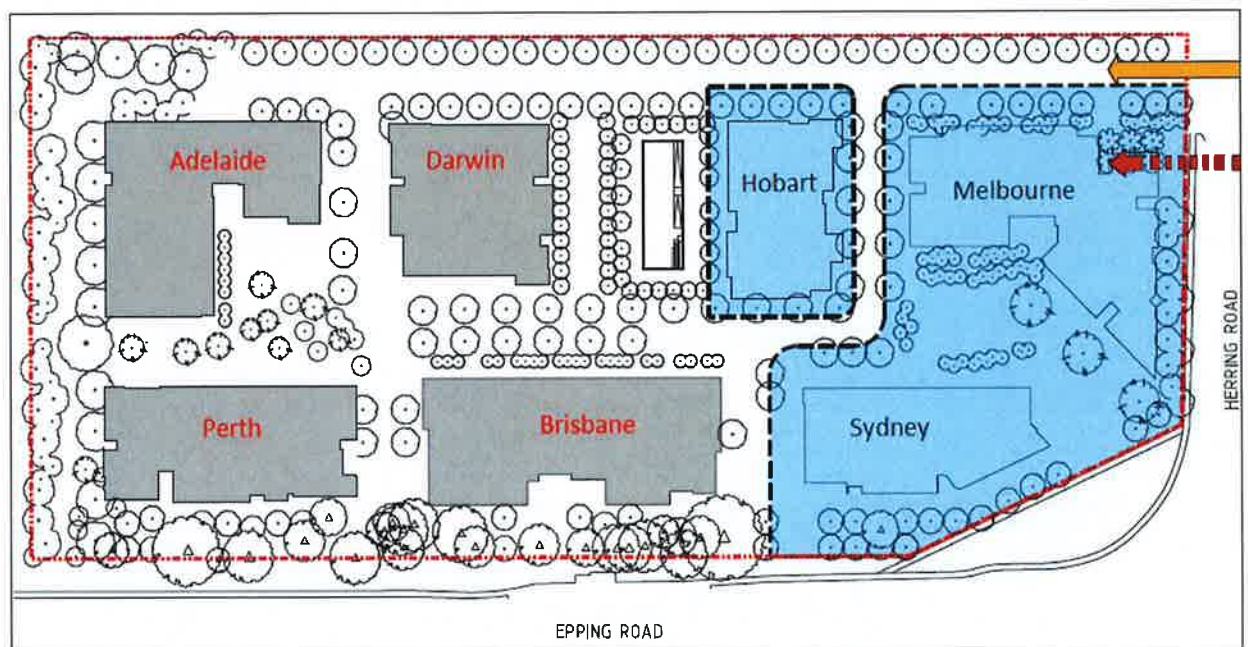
Approved Concept Plan layout and Stage 1 (Stage 2 outlined and shaded in blue)
